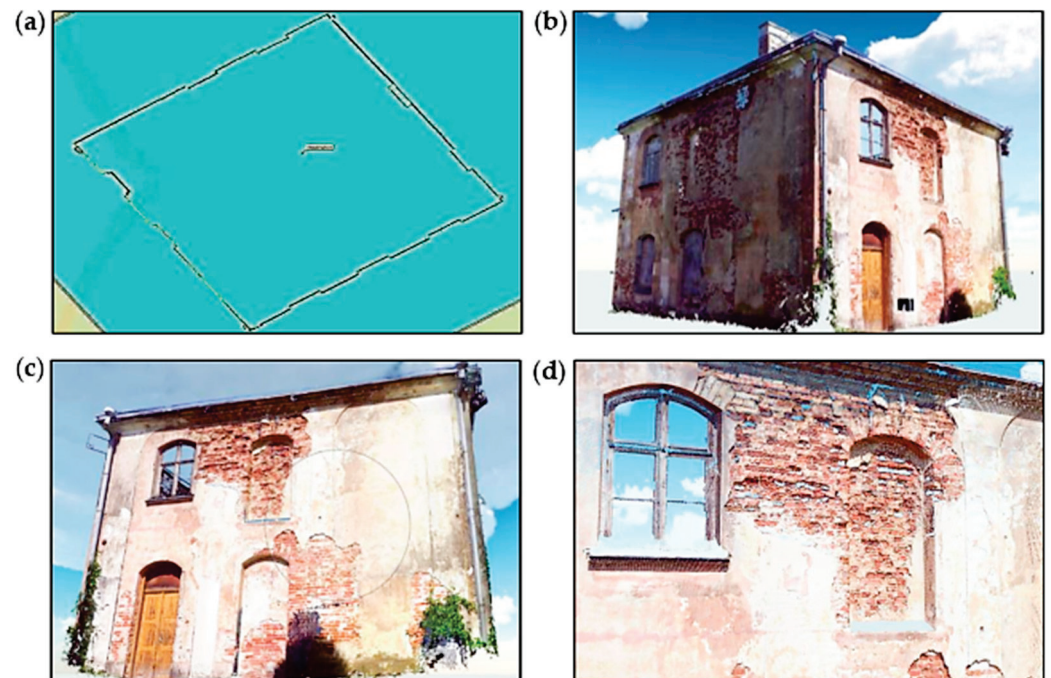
Images obtained based on the point cloud: (a) horizontal projection with building dimensions; (b,c) a view of the external walls and (d) a view of defects in the brick wall.
